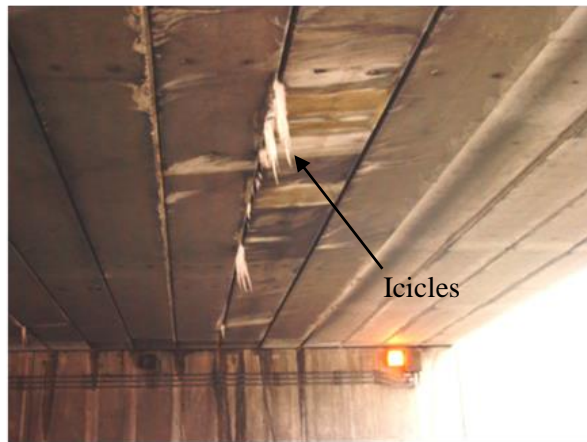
Crack development along the joints in side-by-side box beam bridges
